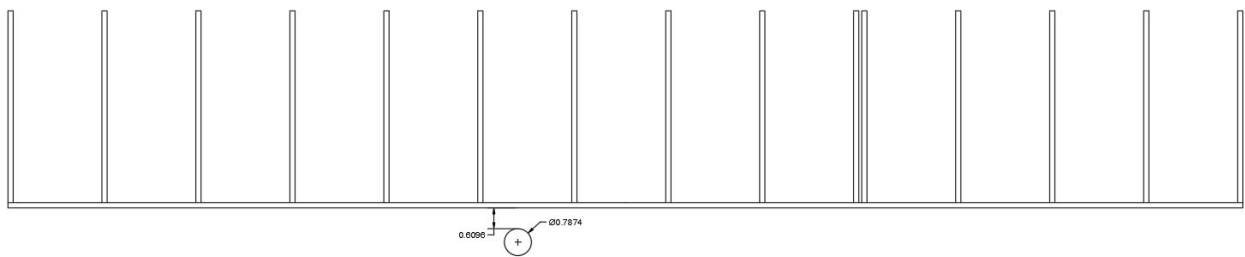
Placement and dimensions of stormwater sewer drain in Covered Area #5.
